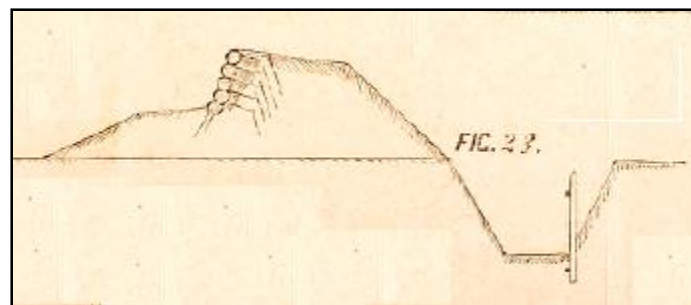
Profile of a parapet and trench earthwork with a fascine revetment and a palisade in its ditch (Mahan 1862:Plate IV).
